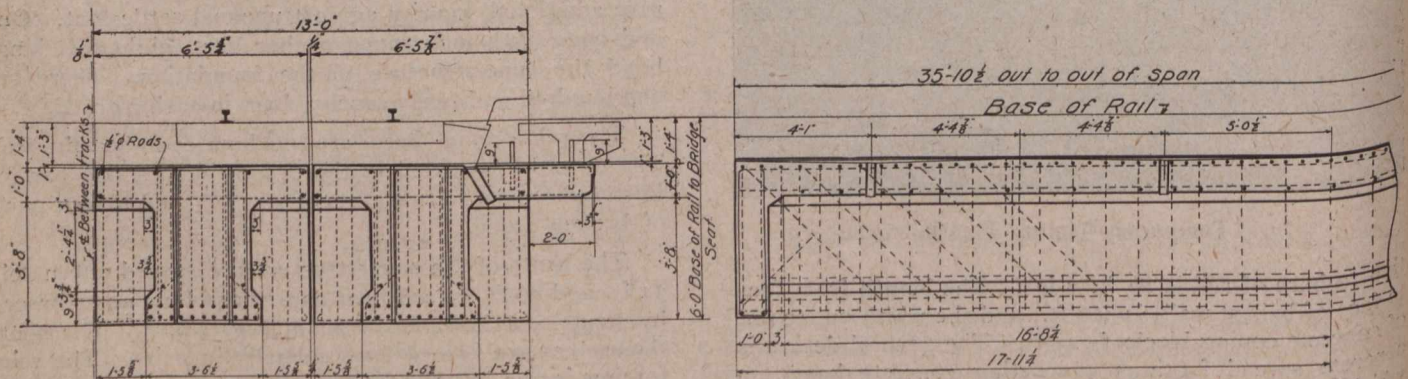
Cross-Section and Longitudinal Section of Inner and Outer Slabs
